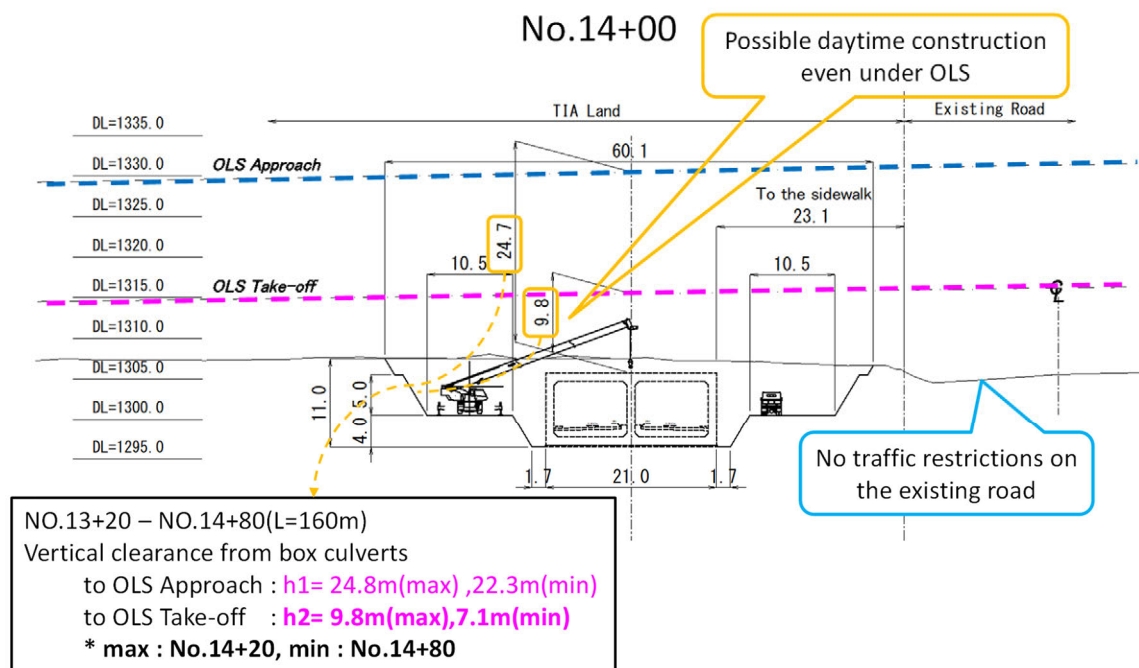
Section-3 (Zone-1) Tunnel
